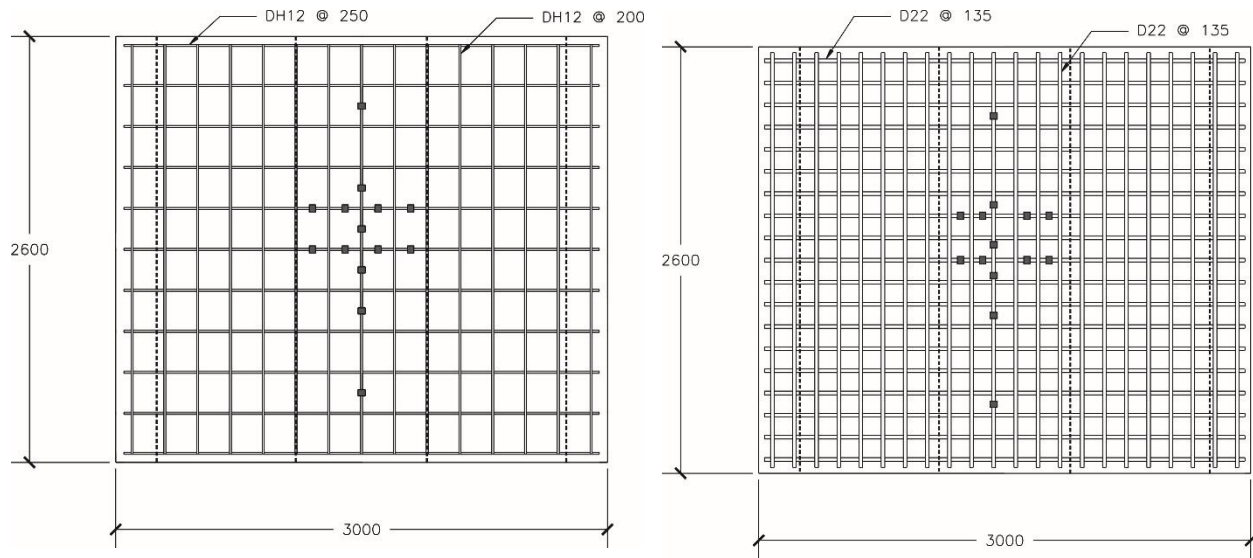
Strain gauge layout for steel (left) and GFRP (right) reinforced slab. Note: Only bottom bars shown. Dotted lines show position of load (inner) and supports (outer).
